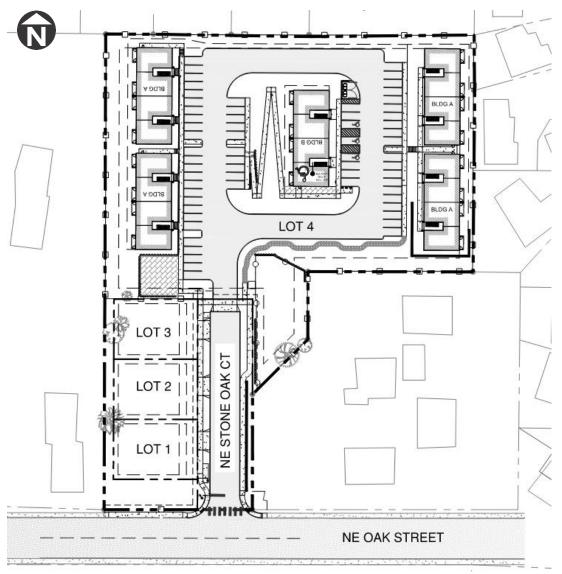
Preliminary Site Plan. Source: BECON Engineering. Dated 9/9/2022
